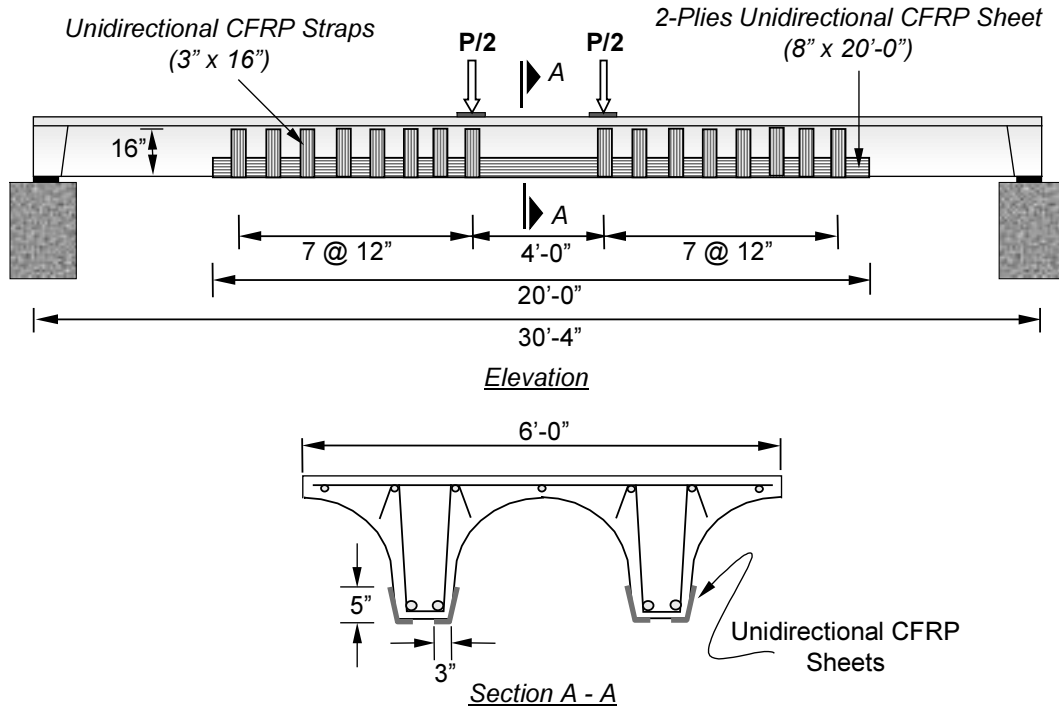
CFRP Strengthening Details for Specimen J-2
